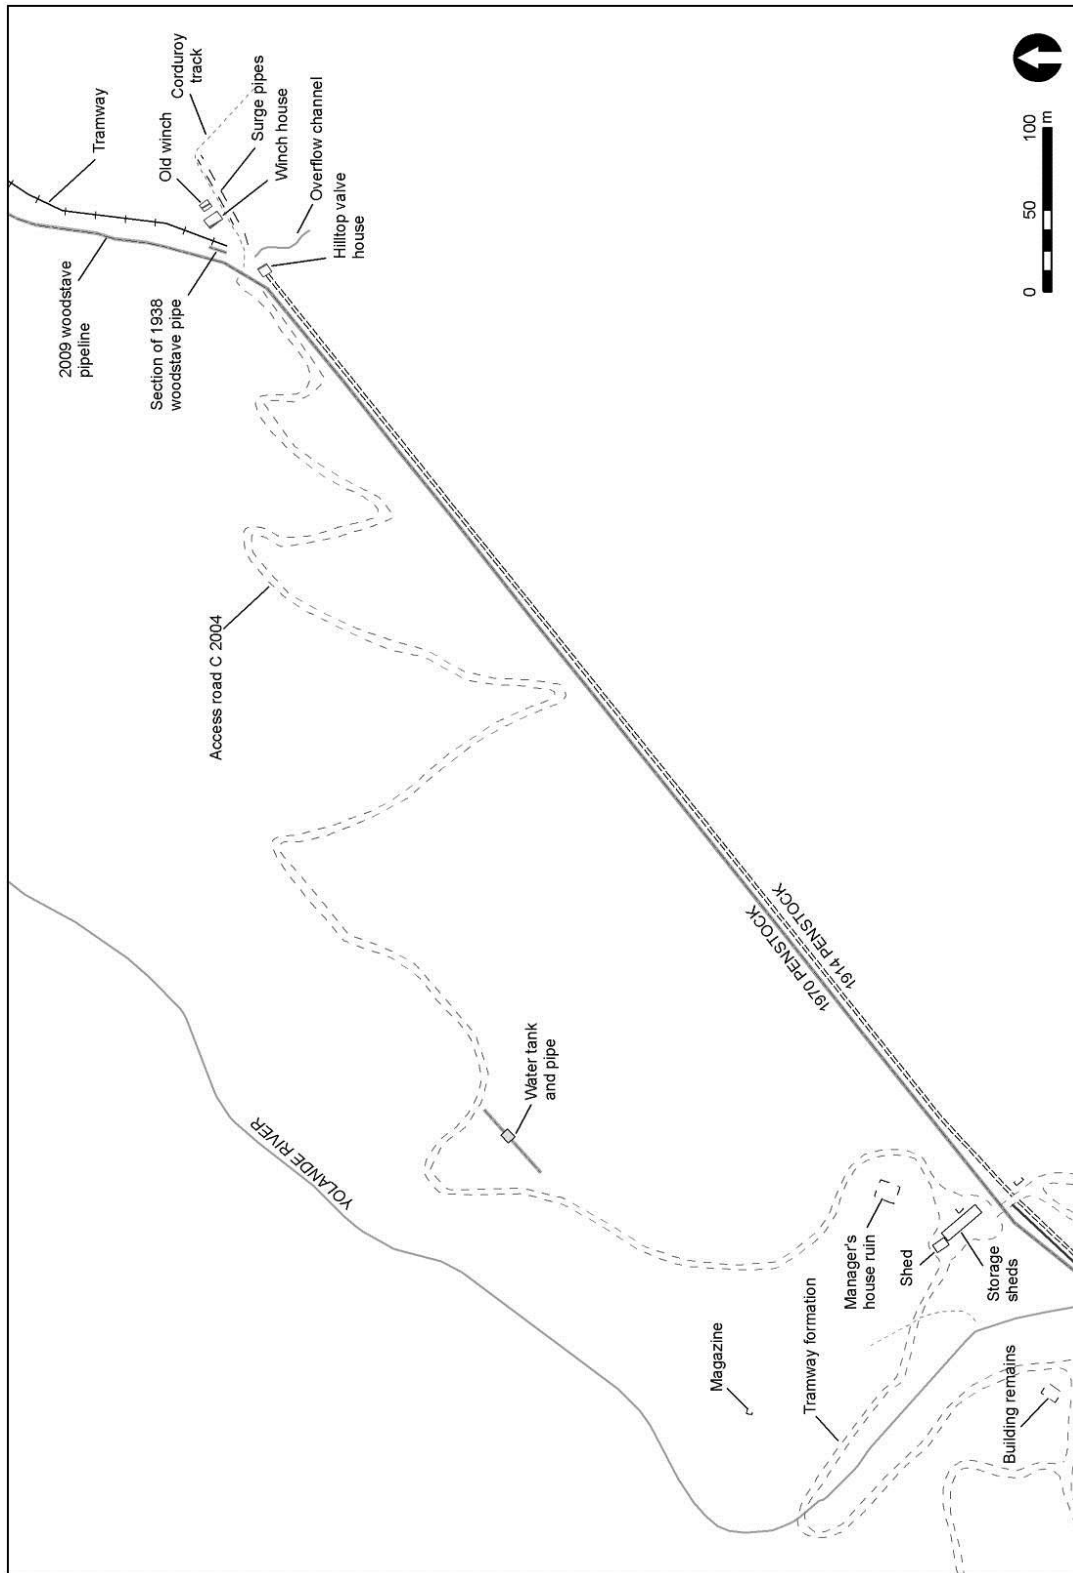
Site Plan of Upper Dam and Pipeline areas
